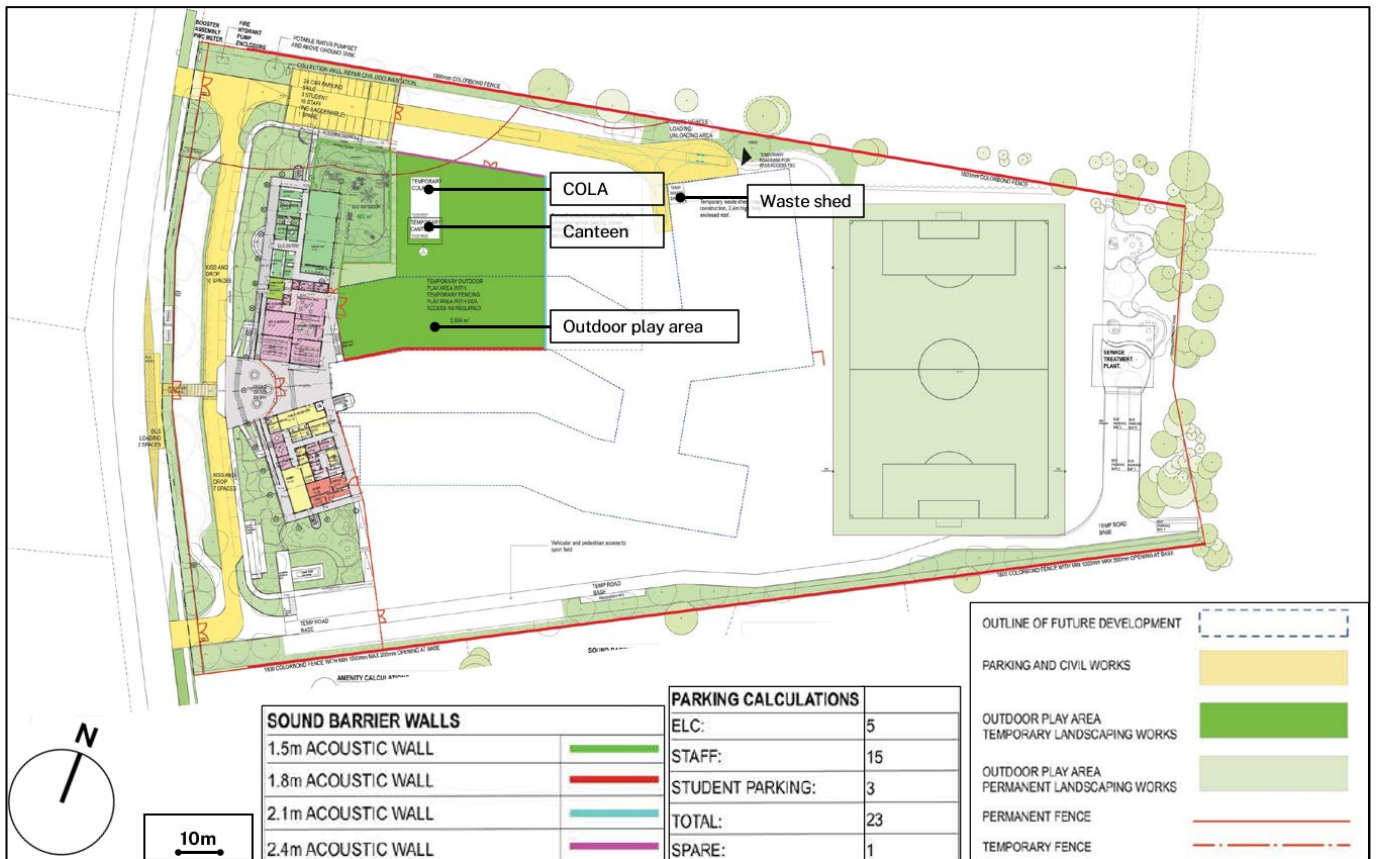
| Stage 1 Ground Floor Plan (Source: Applicant's ARtS, 2025)
